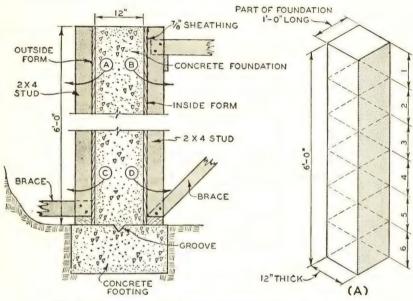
Cross Section of Concrete Foundation Showing Formwork
